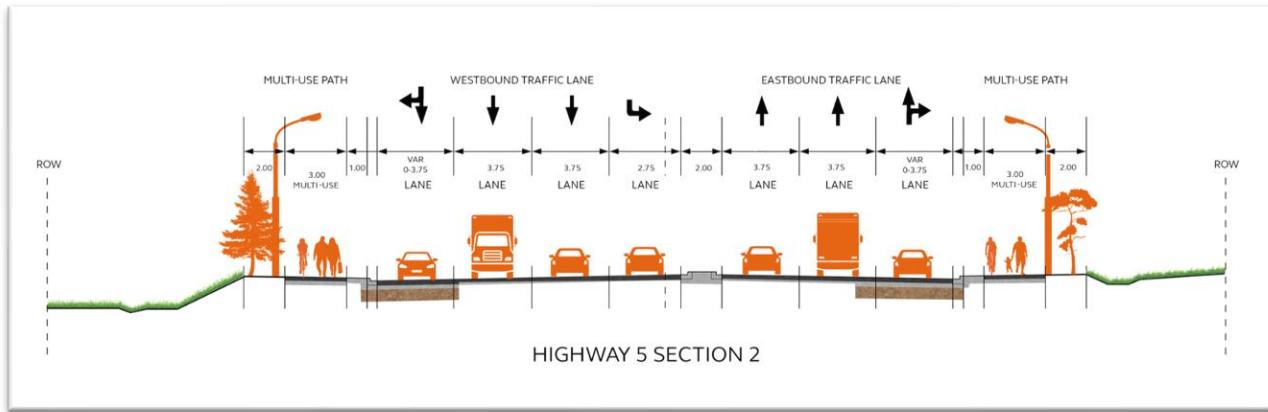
Highway 5 / Dundas St. East – New Construction East of the New Interchange
